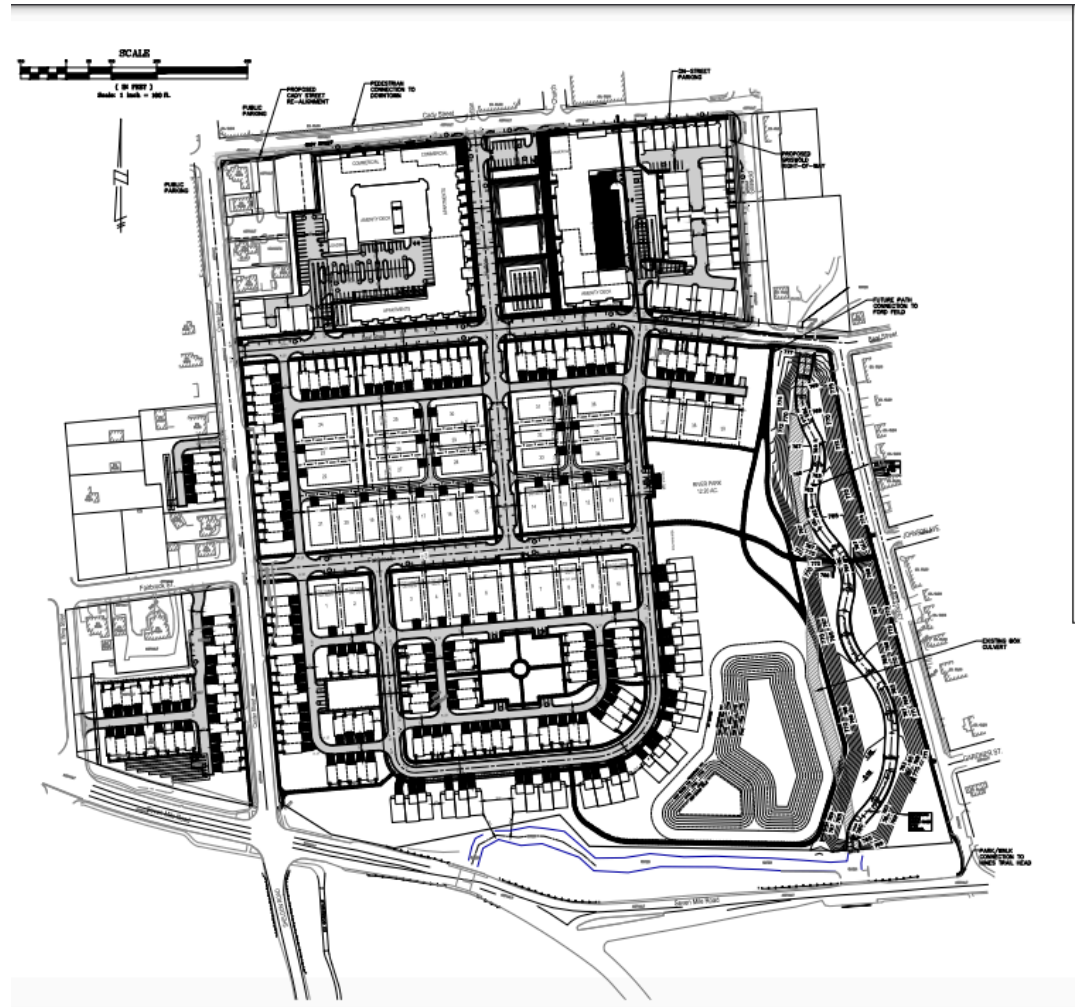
Hunter Pasteur preliminary site plan for Northville Downs (December 14, 2021)
